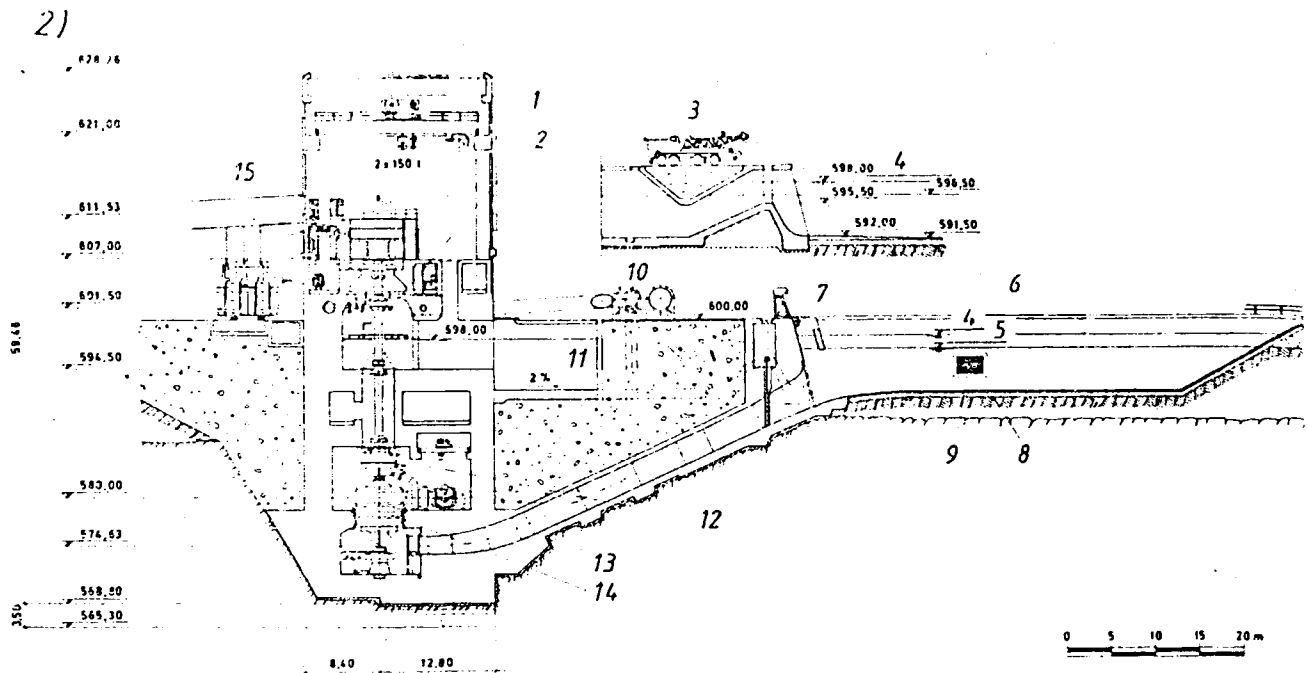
2) Longitudinal section of power house, ternary (tandem) pumped-storage set, tailwater intake and forebay. Rottau, Drau, Austria, main stage of Malta scheme (owner: Draukraftwerke, Klagenfurt, Austria). Outdoor power house of tall hall design with the main crane in its interior, located at the base of the valley slope, founded on mica and sericite slate. 2 ternary pumped-storage sets as shown in the figure, 2 sets without storage pump. The rather long vertical extension of the ternary sets results on the one hand from the need to place the impulse wheel above the maximum tailwater level and on the other hand from the needed submergence of the lowest first pump stage (here 21.1 m) underneath the minimum tailwater level. 1 220 MVA alternator, Stator and rotor, directly water cooled; 2 6-nozzle impulse turbine; 3 tailwater channel exit; 4 maximum permissible tailwater level; 5 minimum permissible tailwater level; 6 forebay; 7 trash rack; 8 relieve zone; 9 cooling water intake; 10 distributor main; 11 tailwater channel; 12 torque converter; 13 pump intake; 14 1-flow, 4-stage storage pump, 144 MW; 15 main transformer 220 MVA. (Drawing courtesy Draukraftwerke, Klagenfurt, Austria)
